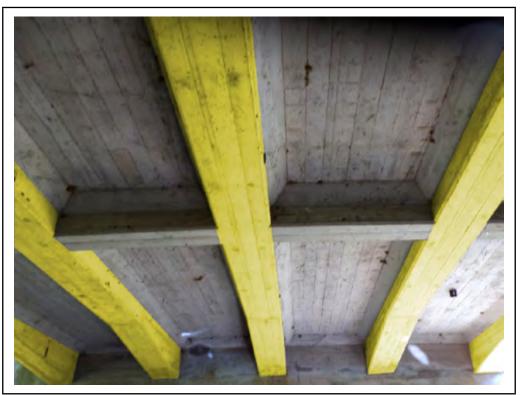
Reinforced Concrete Open Girder / Beam (Highlighted)
